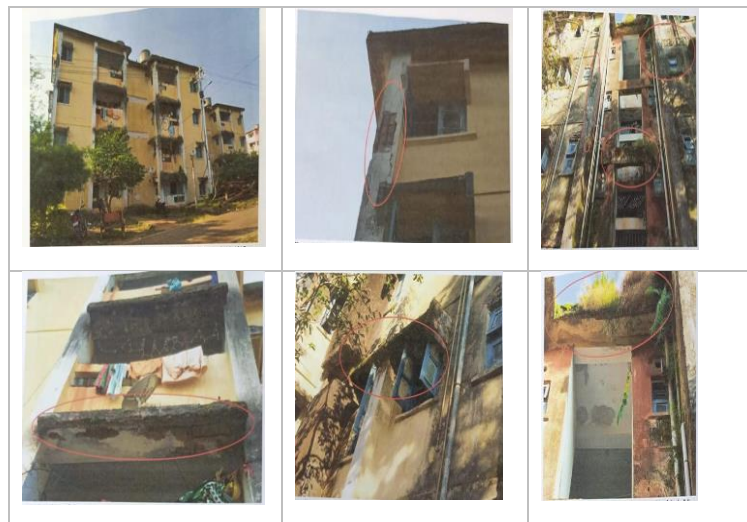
Structural Damage and Deterioration at NAD Sunabeda
